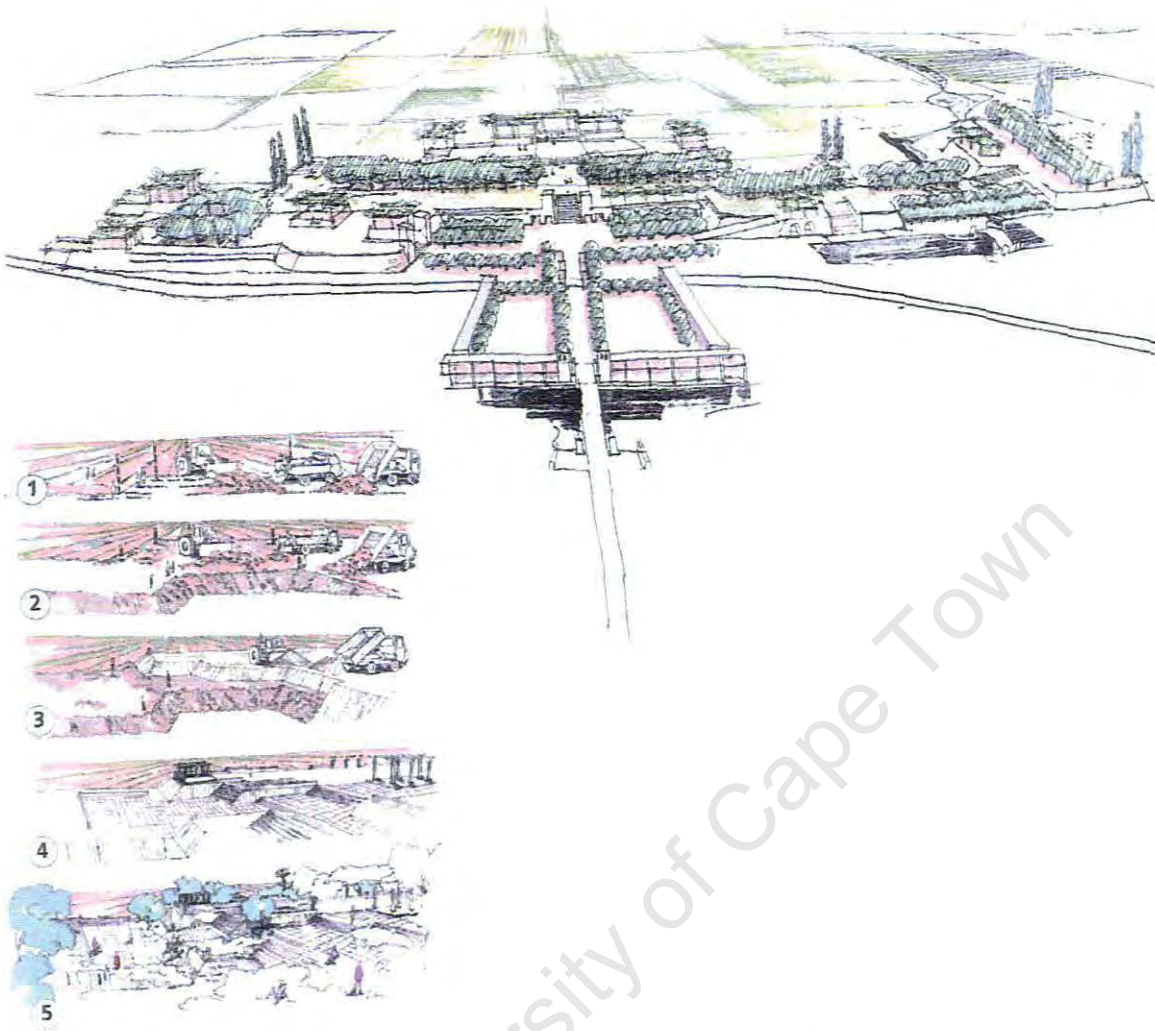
A conceptual drawing of the new metropolitan cemetery and garden of remembrance: a landscaped elevated terrace built over time with building rubble covered in sand and soil (Source: City of Cape Town, 1999b).
